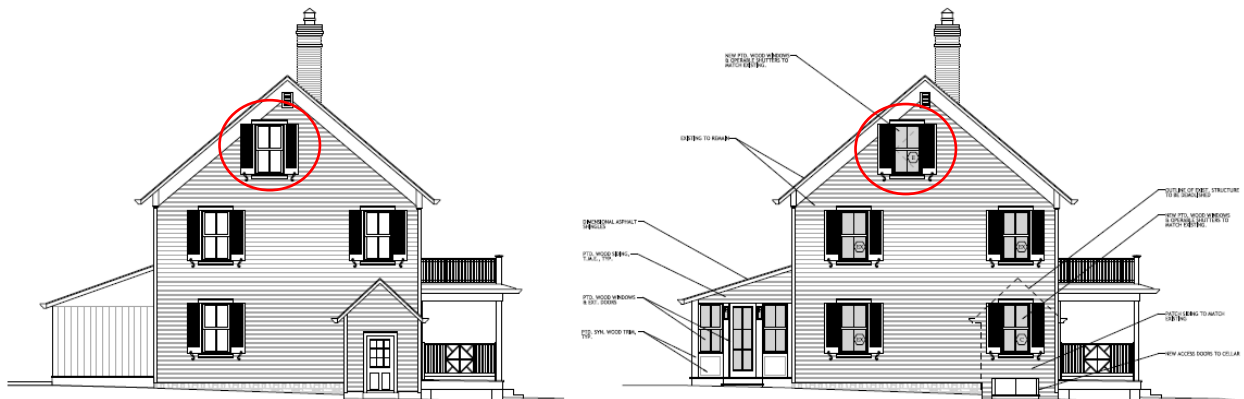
South elevation drawings, existing (left) and proposed (right). The red circle show the location of the window proposed to be replaced.
